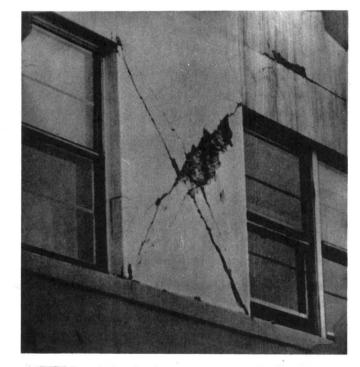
/46 : Typical example of X-cracking induced by seismic waves in panel within beam and column frame : building in Anchorage, after earthquake of 27.3.1964
